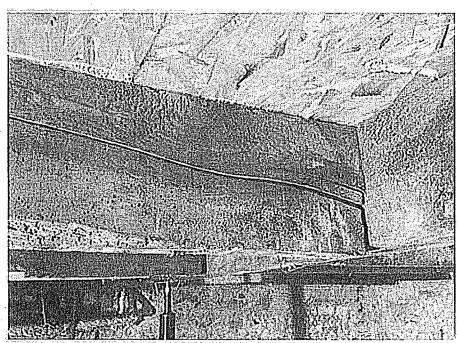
Joist with apparent insect deterioration and shear failure.
